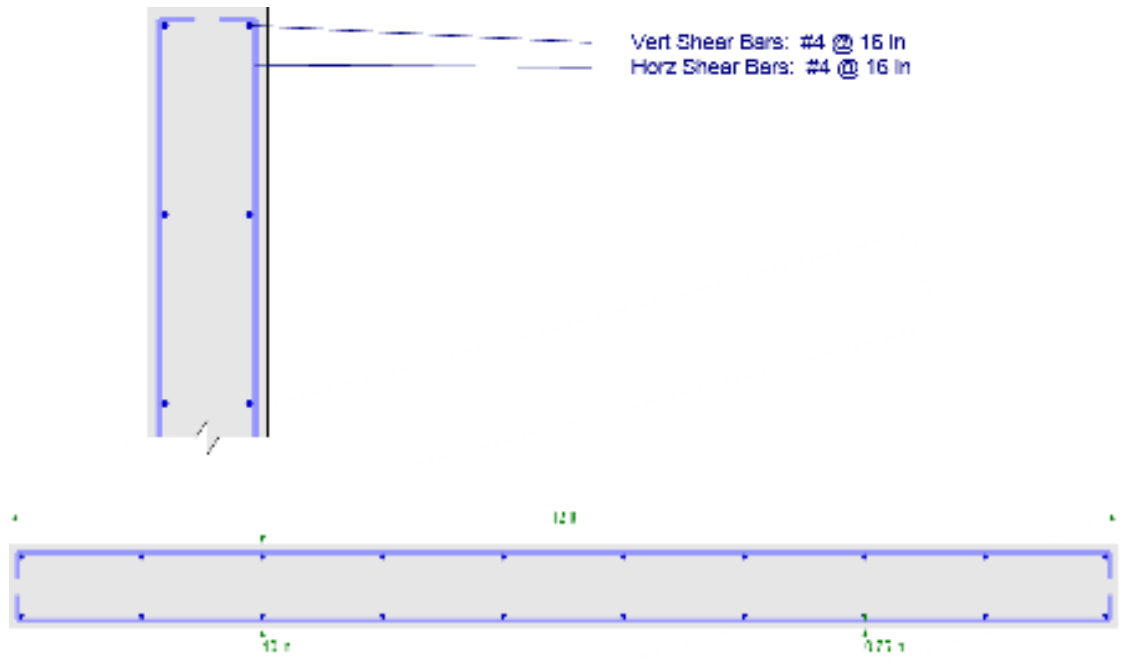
Building (B8-9S-L-O) Ordinary RC Shear Reinforcement Details; Wall Section for Floors 4-6
